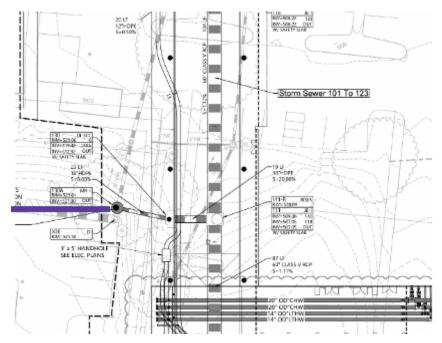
Storm line connection to existing doghouse manhole in phase I.
